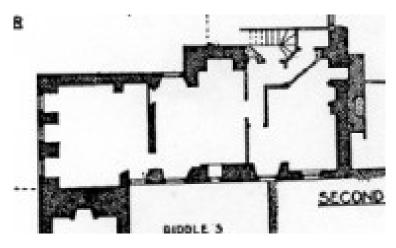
Northern Block - Second Floor Room Arrangement 1951
